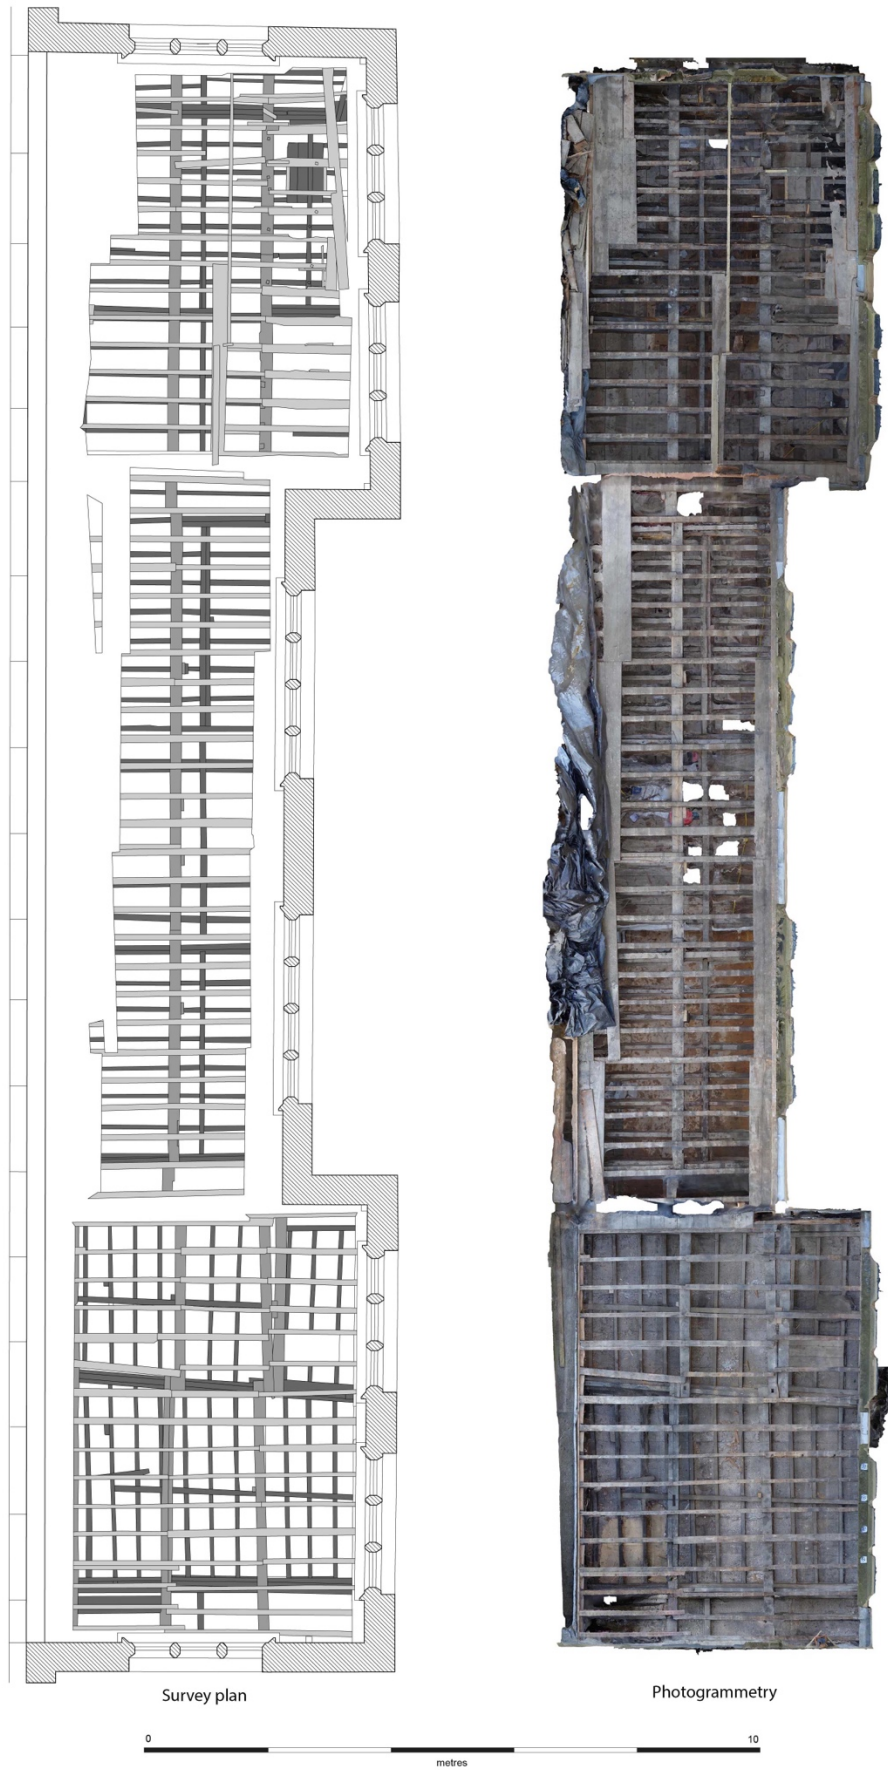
Survey plan of roof timbers and photogrammetric image following archaeological recording
